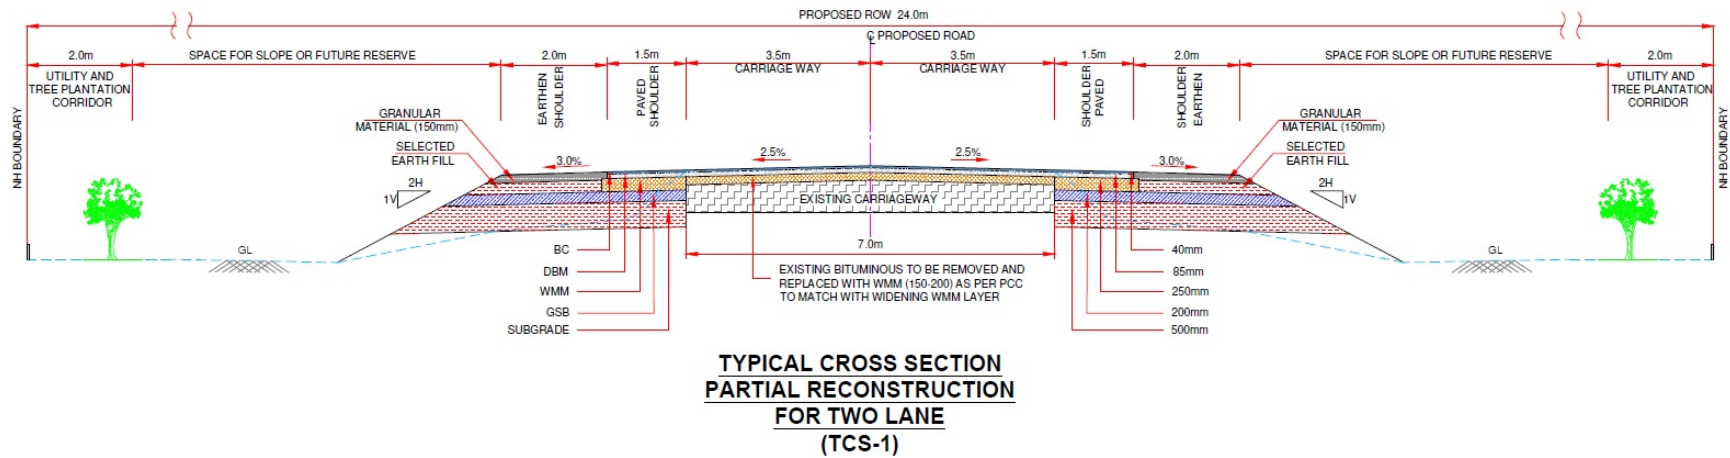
Typical Cross Section Partial Reconstruction for Two Lane
